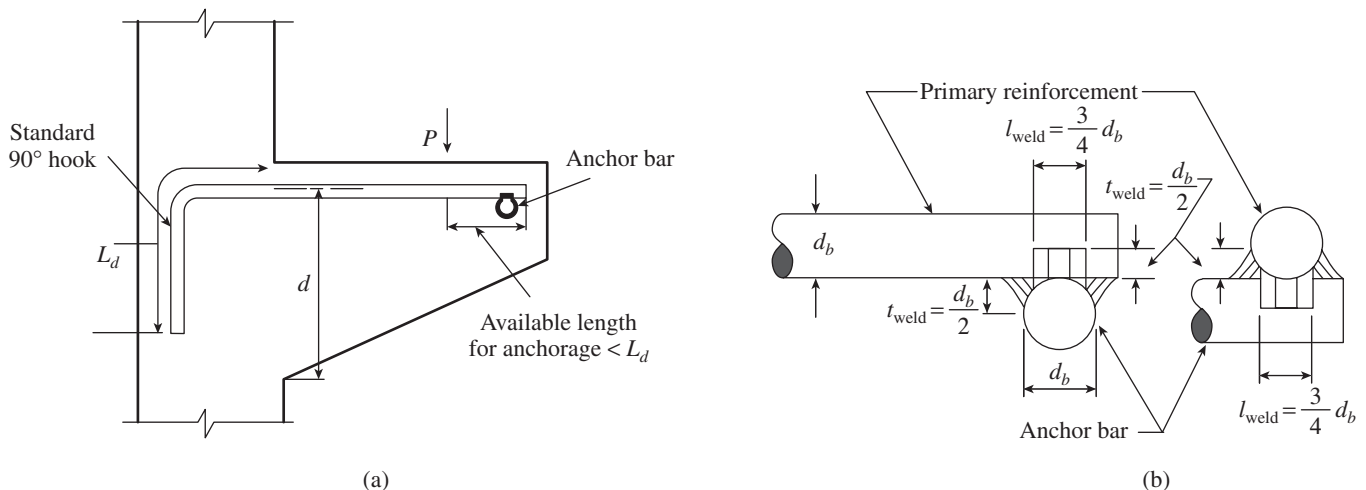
Anchorage of main reinforcement in corbels (a) Required anchorage (b) Details of welding main bar to anchor bar (Reprinted with permission from ACI)
